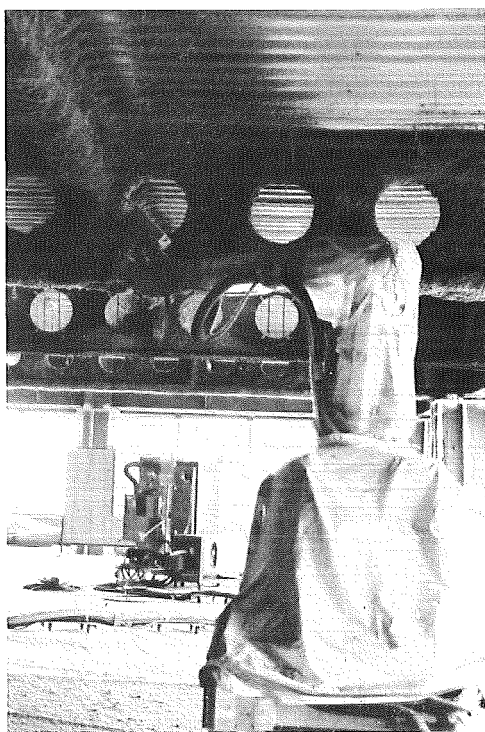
Shimizu Fireproofing Robot Spraying Structural Steel in a Building (Courtesy of Shimizu Construction Company)
